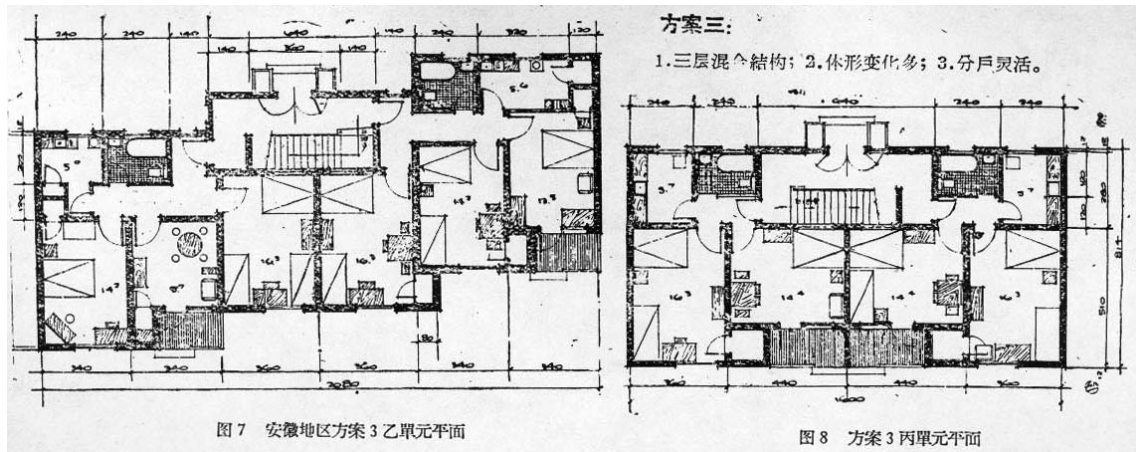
Housing plans with horizontal stairs, 1959-1960, Design Institute of Anhui Province
